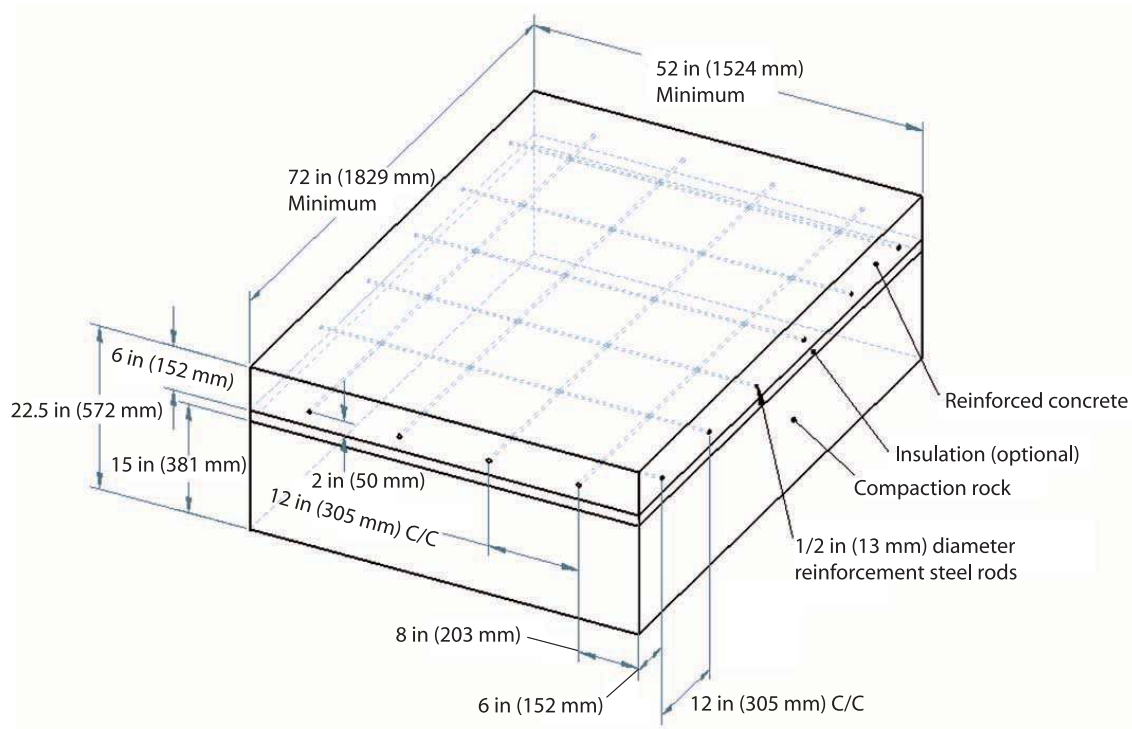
illustrates the concrete slab detail for a typical outdoor application.
